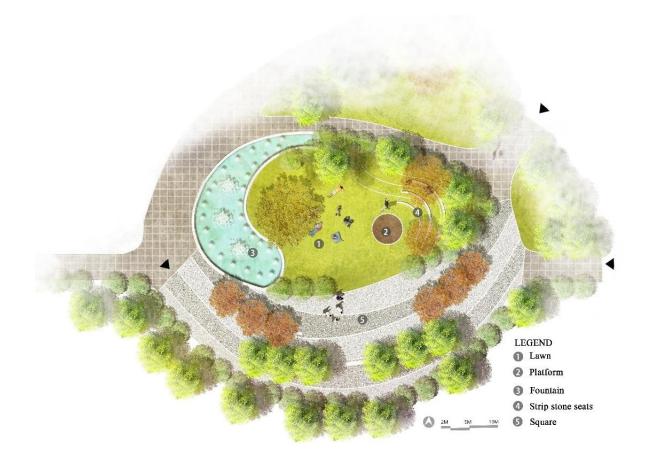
New master plan of Zhengxin Park design area. Source: by author
